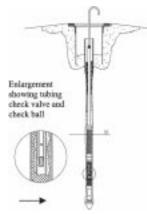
One method of well development is by using a simple tubing check valve assembly. This assembly is oscillated up and down to simultaneously surge and purge the well. In finer grained formations the use of a peristaltic pump or bladder pump may be preferred to prevent clogging of the well screen.
